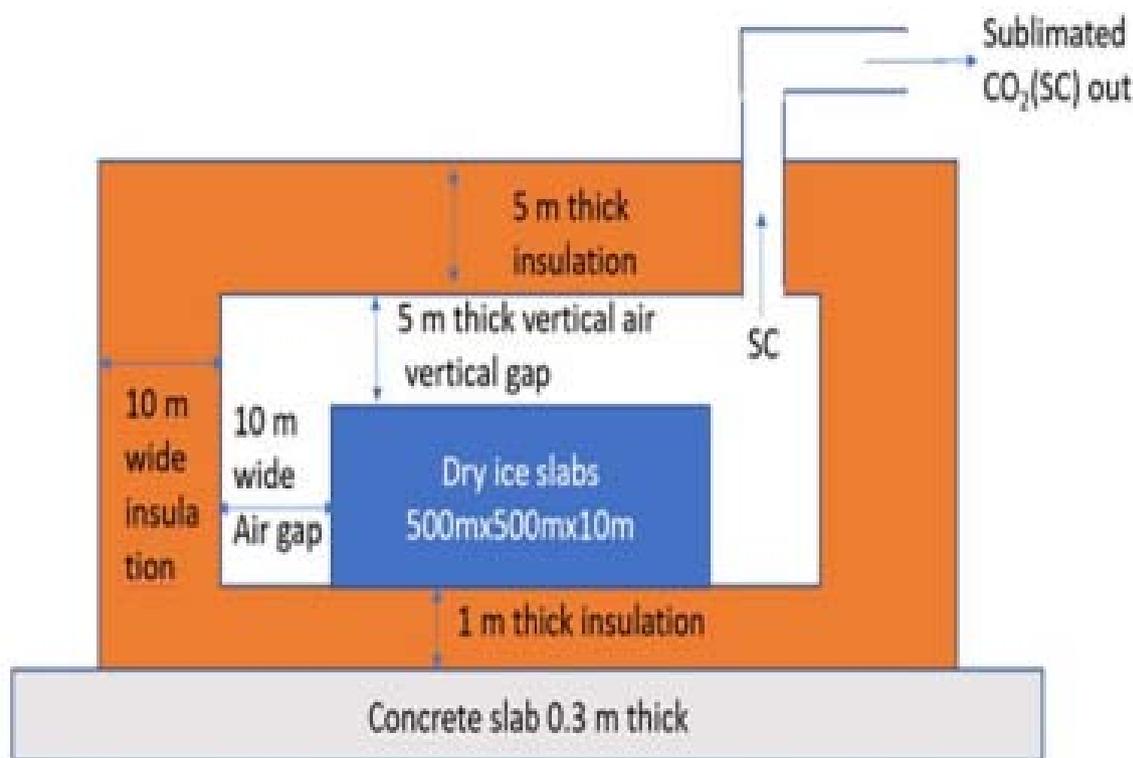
Vertical cross-sectional view of the dry ice storage system
